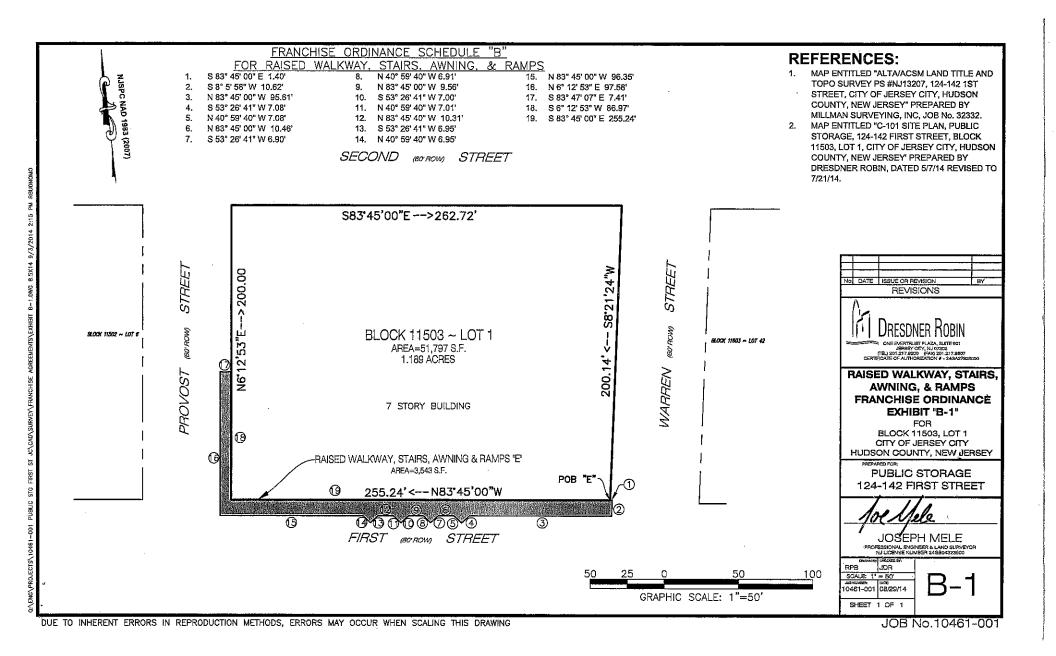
Raised Walkway, Stairs, Awning & Ramps Franchise Ordinance
